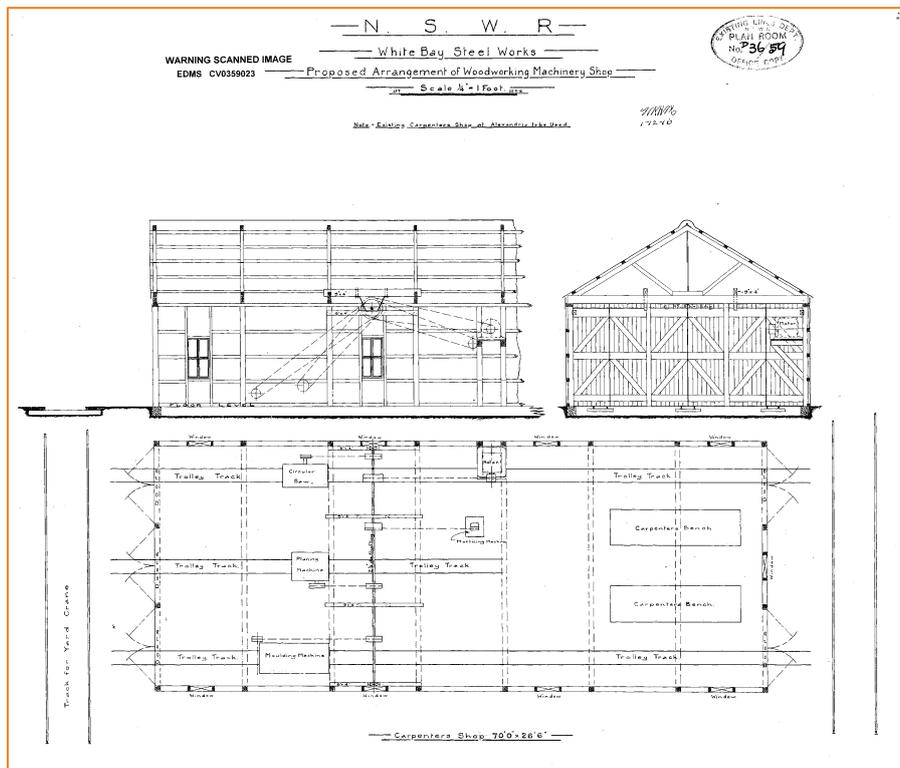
Plan for the 'Proposed Arrangement of Woodworking Machinery Shop' at the White Bay Steel Works, dated 25 November 1916, noting 'Existing Carpenters Shop at Alexandria to be used'. Source: Transport for NSW Plan Room, 0359023
